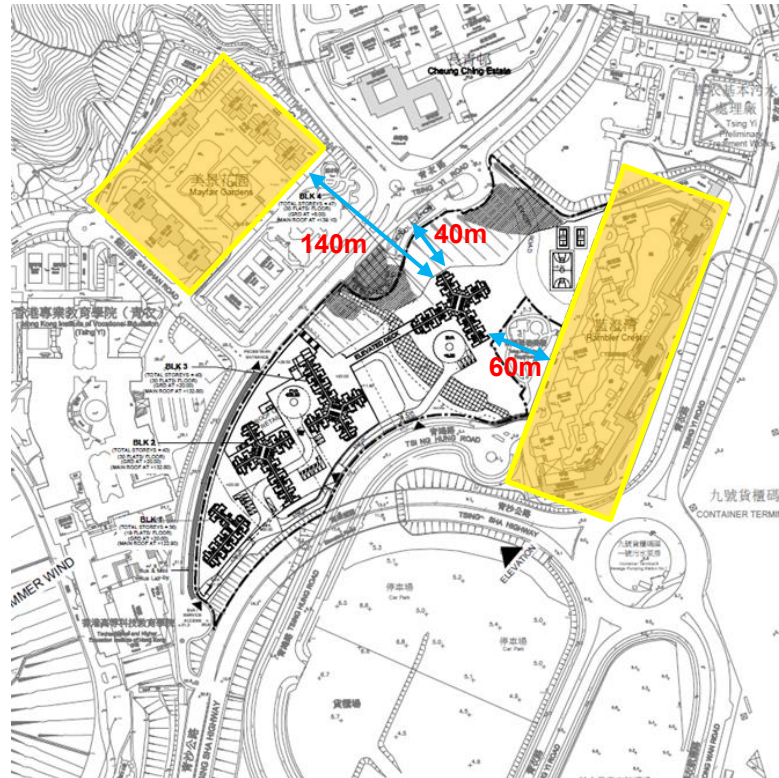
Building Separation under Existing, Baseline and Proposed Scenarios
